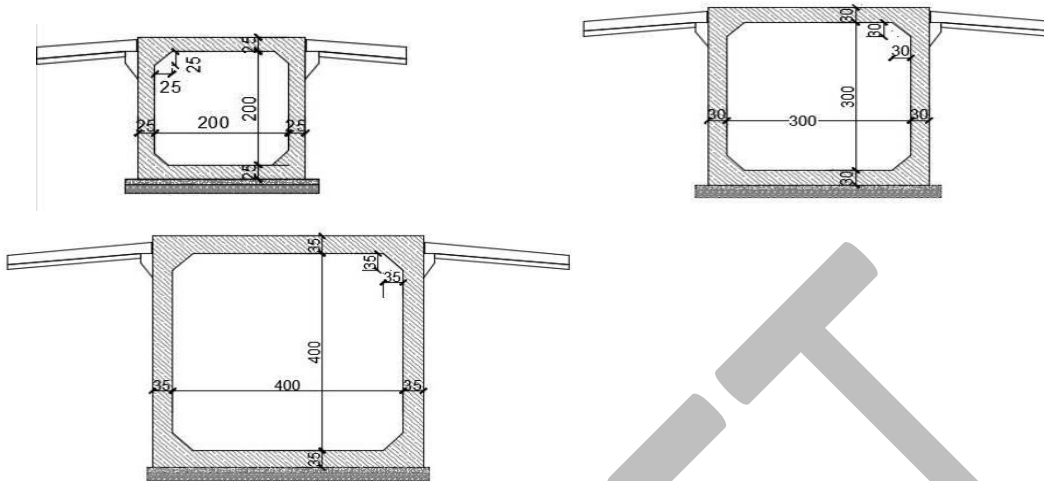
Proposed cross-sections, for 2x 2, 3x3 and 4x4 box culverts
